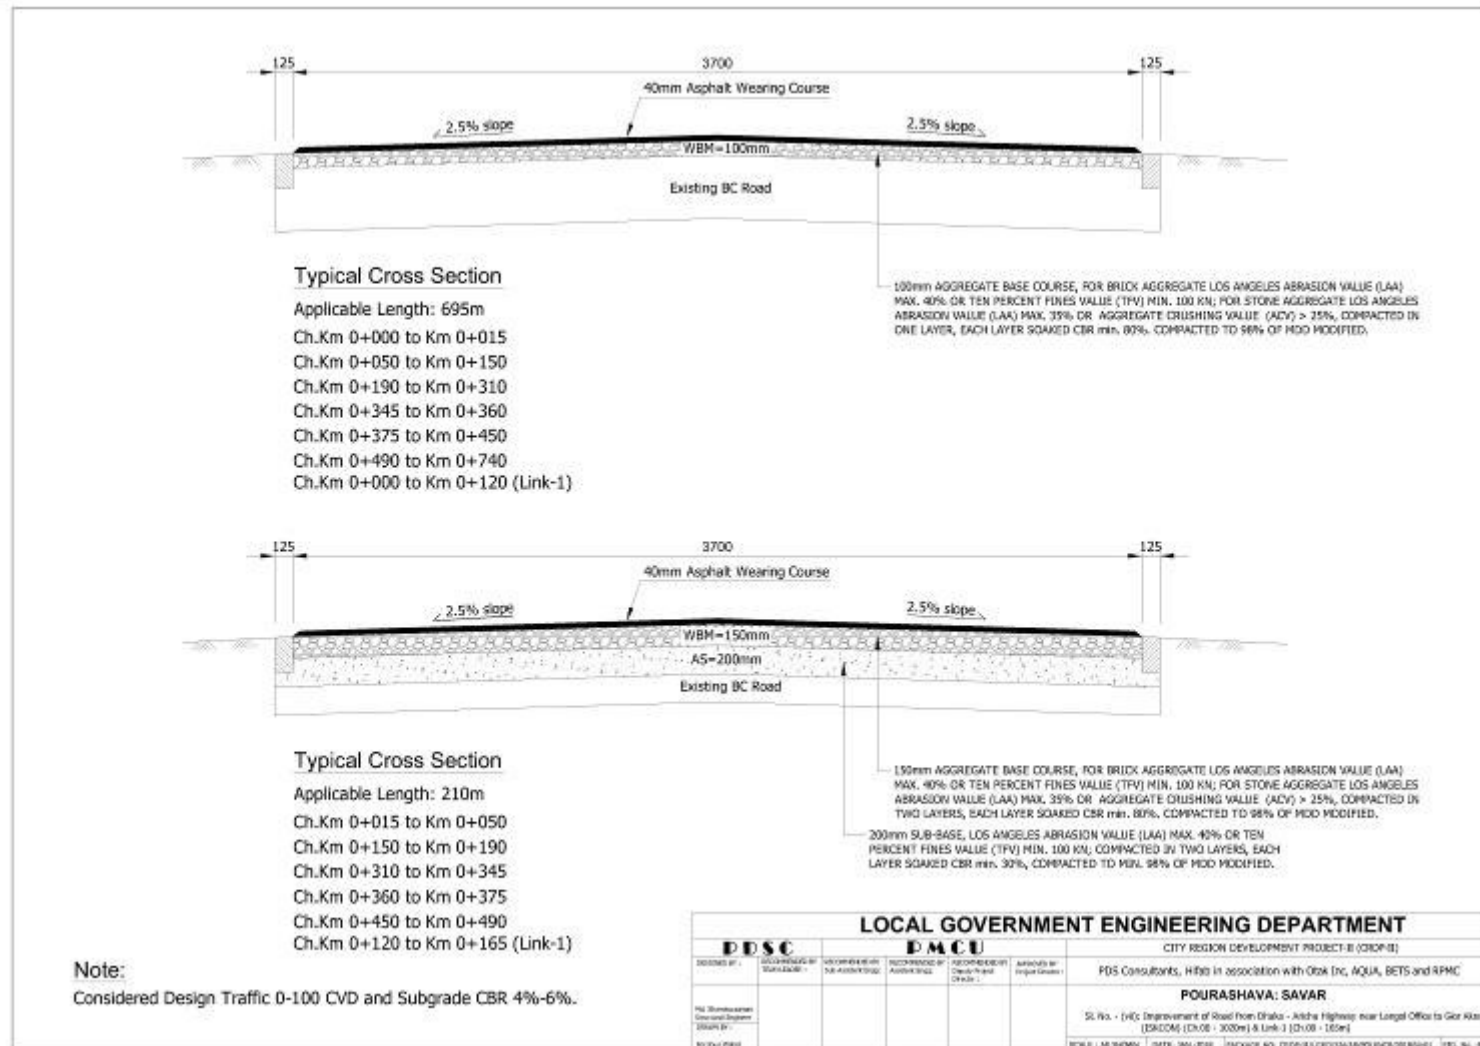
Cross section of Road from Rashid member's morh to Bedepara Bridge via Badda deep machine morh
